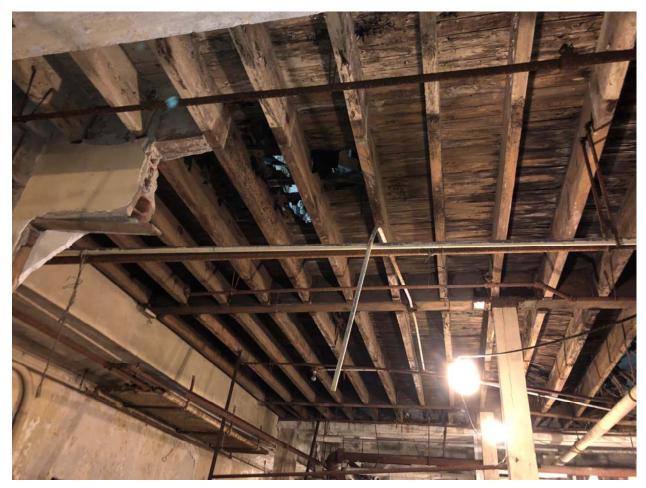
Underside of wood framed area of stage floor. There is much water damage to this area due to roof leakage. All of this wood framed floor must be removed and replaced.
